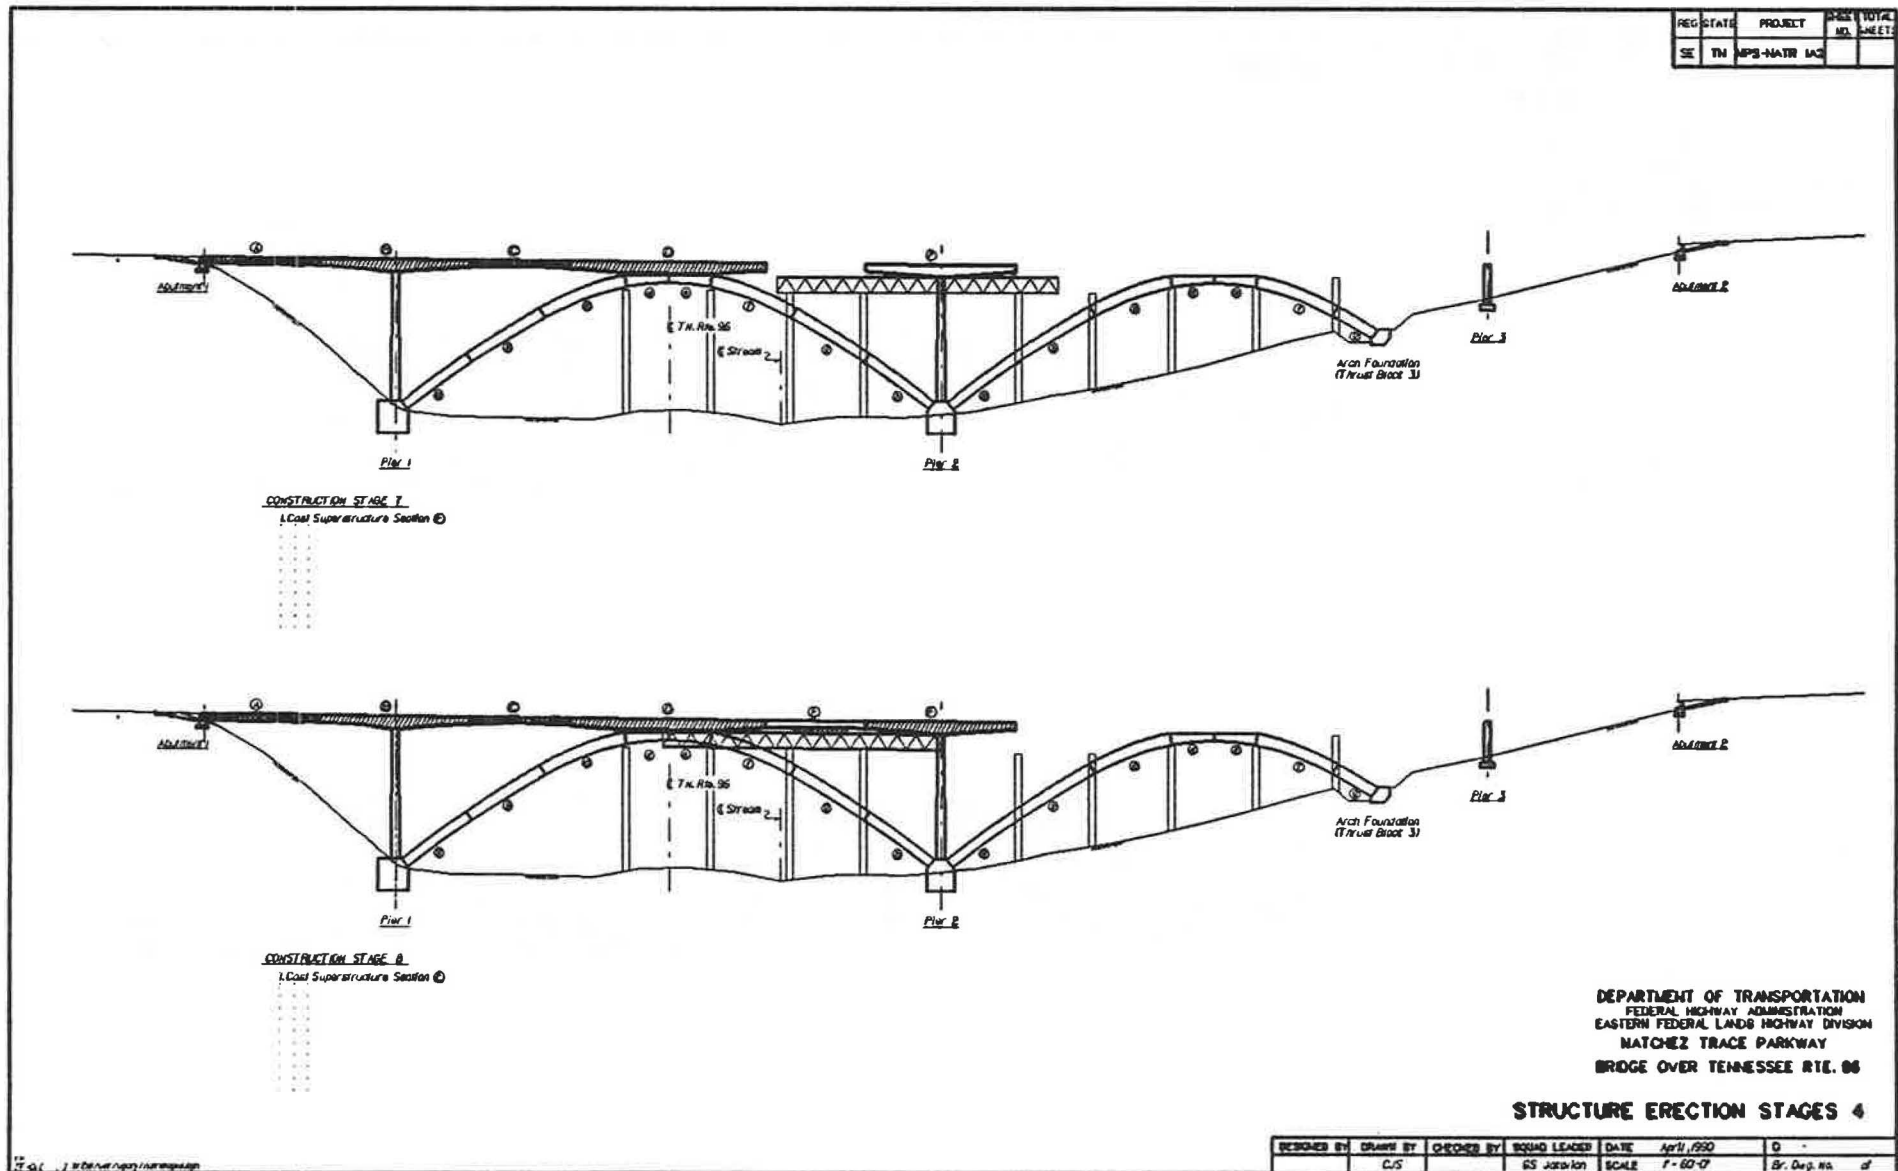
Construction stages 7 and 8 showing pier 2 cantilever and span 4 closure placement
